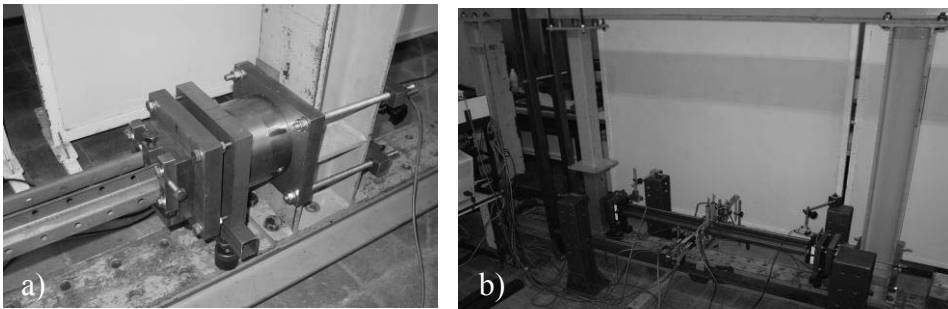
Test setup: a) Specimen end support with grip; b) Testing frame.
